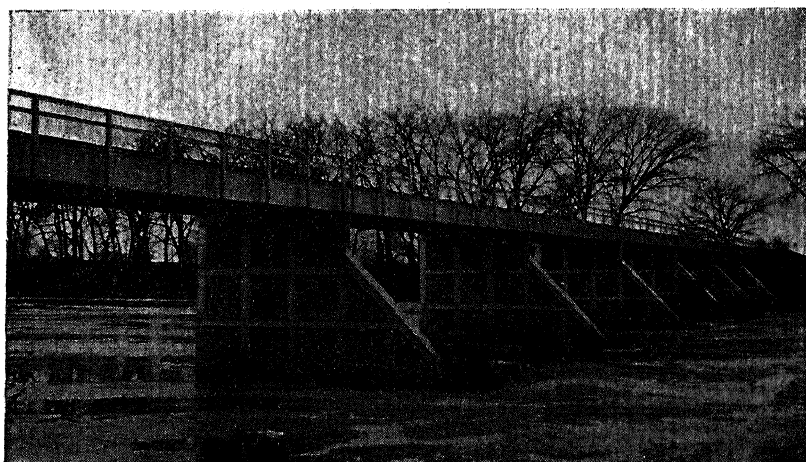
Secondary road bridge of all welded construction. Steel pile piers and ice breakers have concrete webs above water line to prevent lodging of trash. All fabrication in the field by welding for simplicity and economy.
